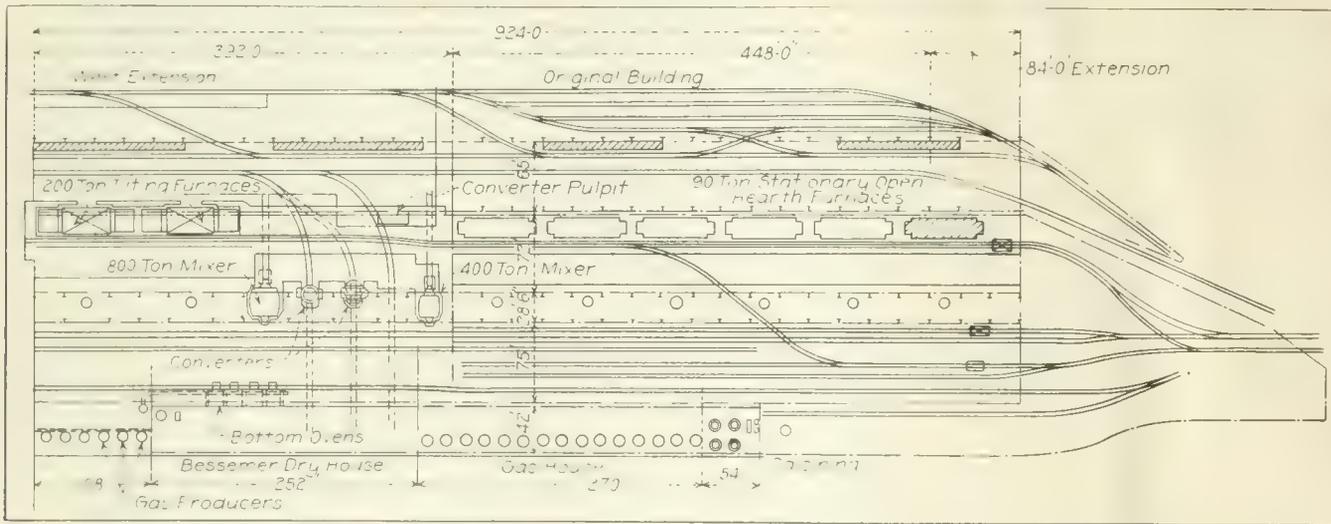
Plan of Open Hearth Building of Pennsylvania Steel Co., Steelton, Pa., Showing Layout of Furnaces and Equipment.
